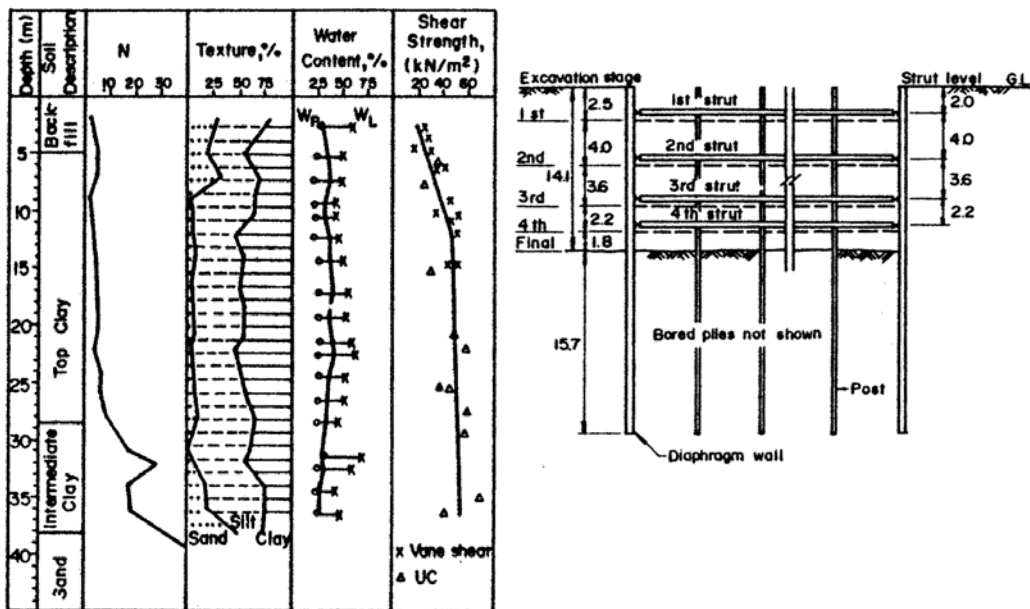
Typical Cross-Section of Deep Excavation and Soil Profile at Taipei Basin (Fang, 1987)
